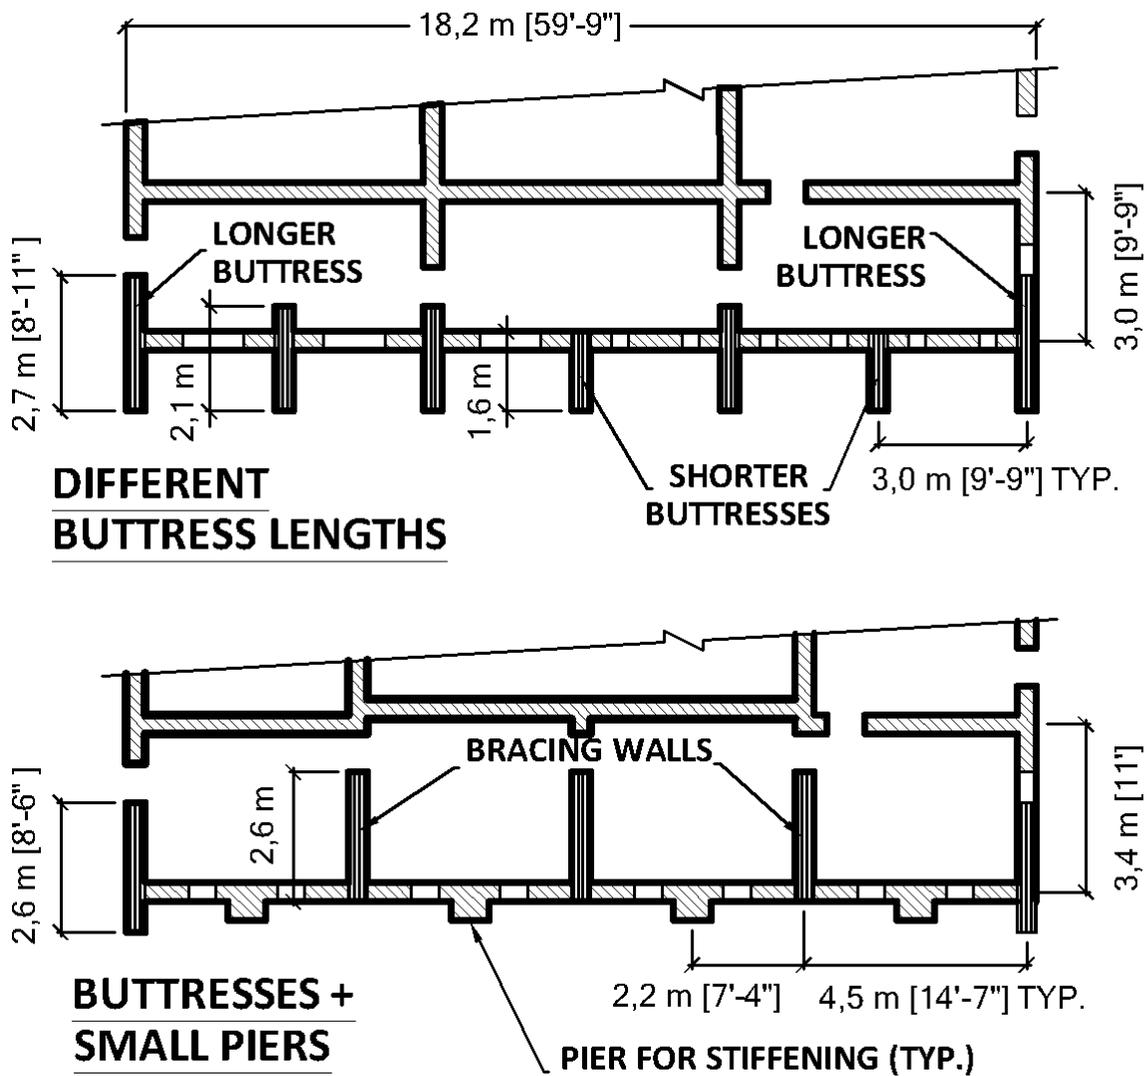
Examples of bracing panel sizes at different bracing line distances (above to below): a- Different buttress lengths to maximize rooms with 3 m (9'-9") bracing line distances; b- Wider 4,5 m (14'-9") bracing line distances used with stiffening piers between bracing panels.
